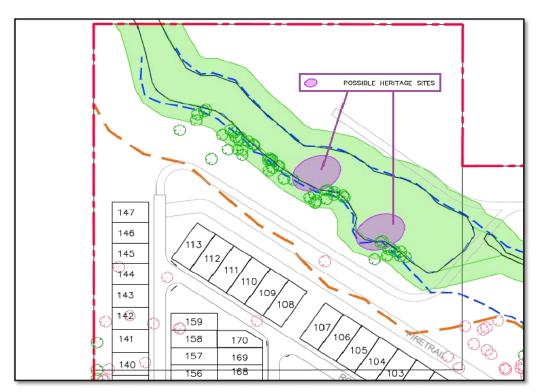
Location of PADs in relation to (Source: Proposed Plans)
